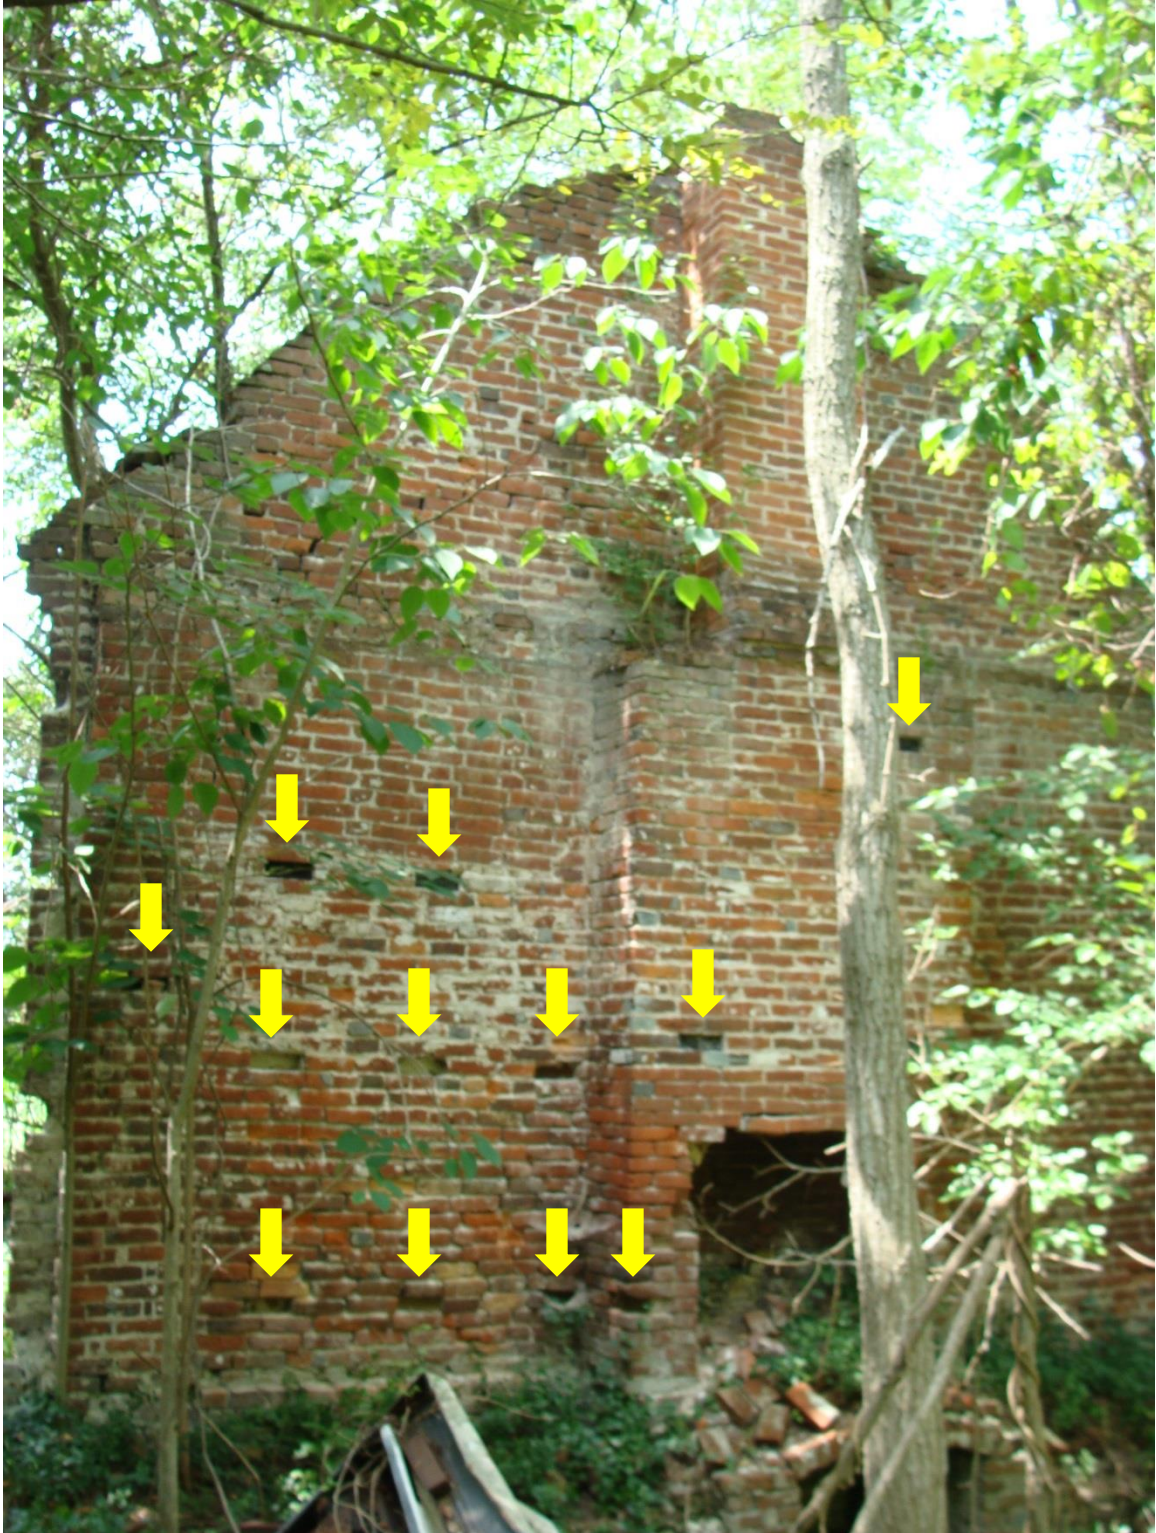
View of the interior surface of the west brick end at Rogers Place. The yellow arrows point to pockets in the masonry that originally held wood nailer boards to which were fastened a floor-to-ceiling wood paneled surface. Photo by author
